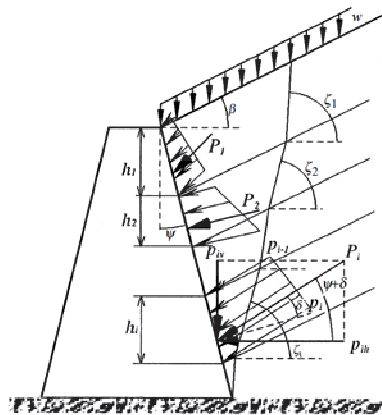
Schematic Diagram of Earth Pressure Acting on Retaining Wall
